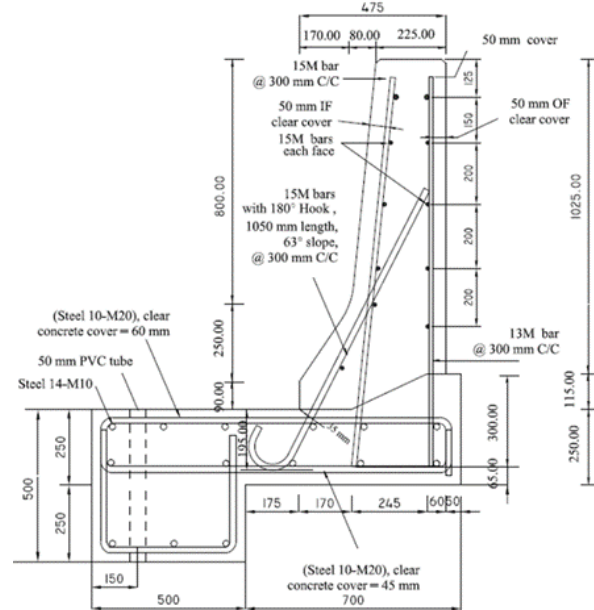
Specimen B-2 for interior portion with 180° hook facing inward at 300 mm spacing
